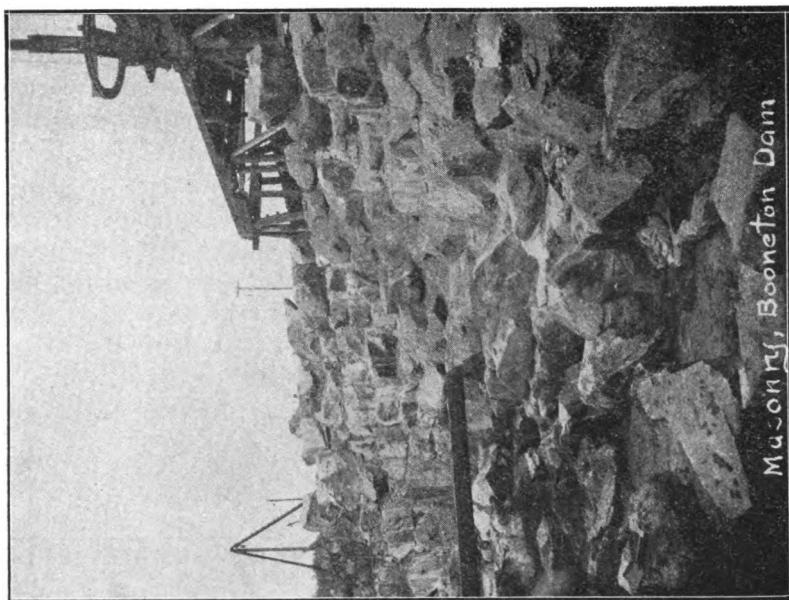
Cyclopean Masonry, Boonton, Dam.
